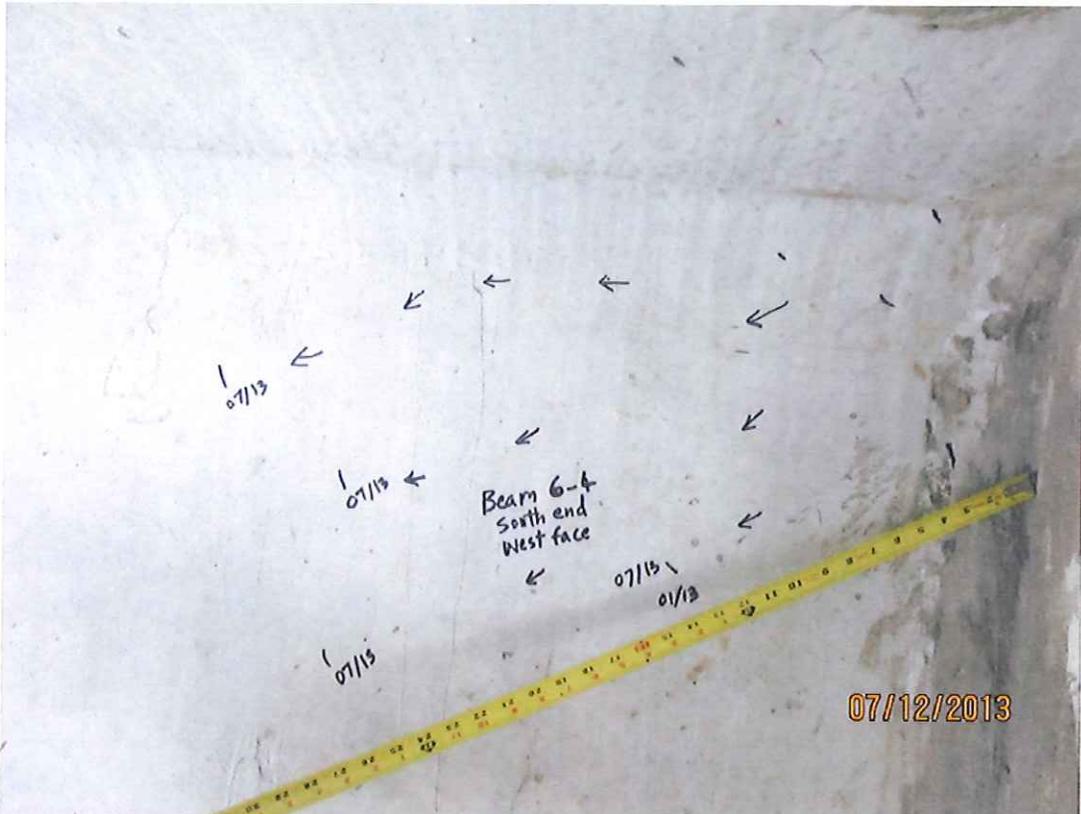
Cracks in west face of web at south end extending down and away from beam end
